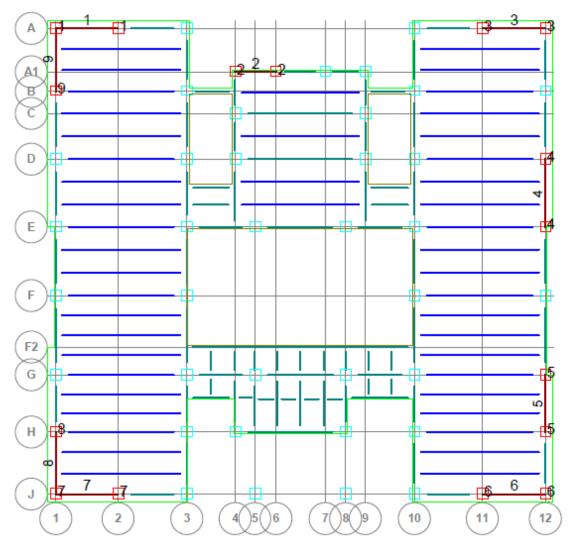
Braced Frame Locations (2nd Floor and Roof)
